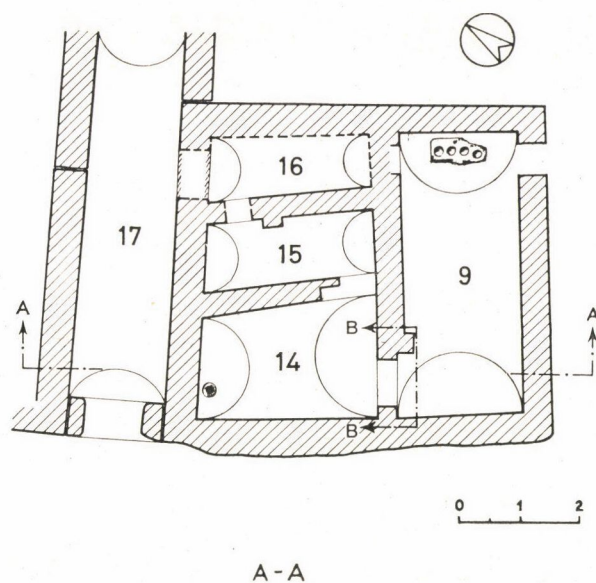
Ground-plan and section A-A, rooms C/I 9, 15, 14, 16, 17
